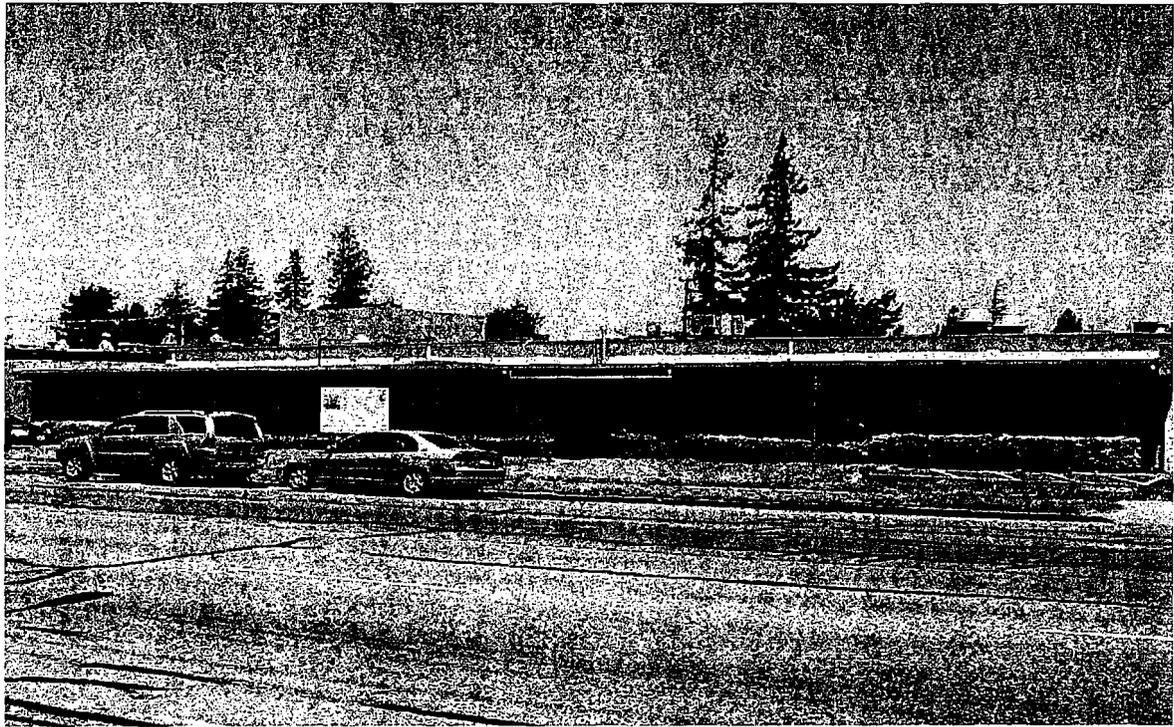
View of site from Fourth Street, showing the existing building on the site.
